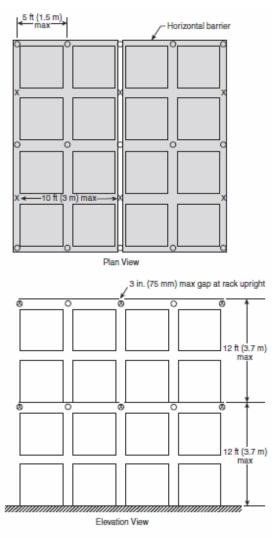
(A) Alternative Protection for Multiple-Row Racks.
